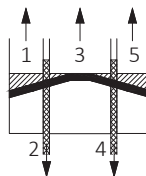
Possible deformation pattern of a fastener with four shear planes in a steel-to-timber connection with thin steel plates and thin timber side members (see case k in Figure E15-4).
